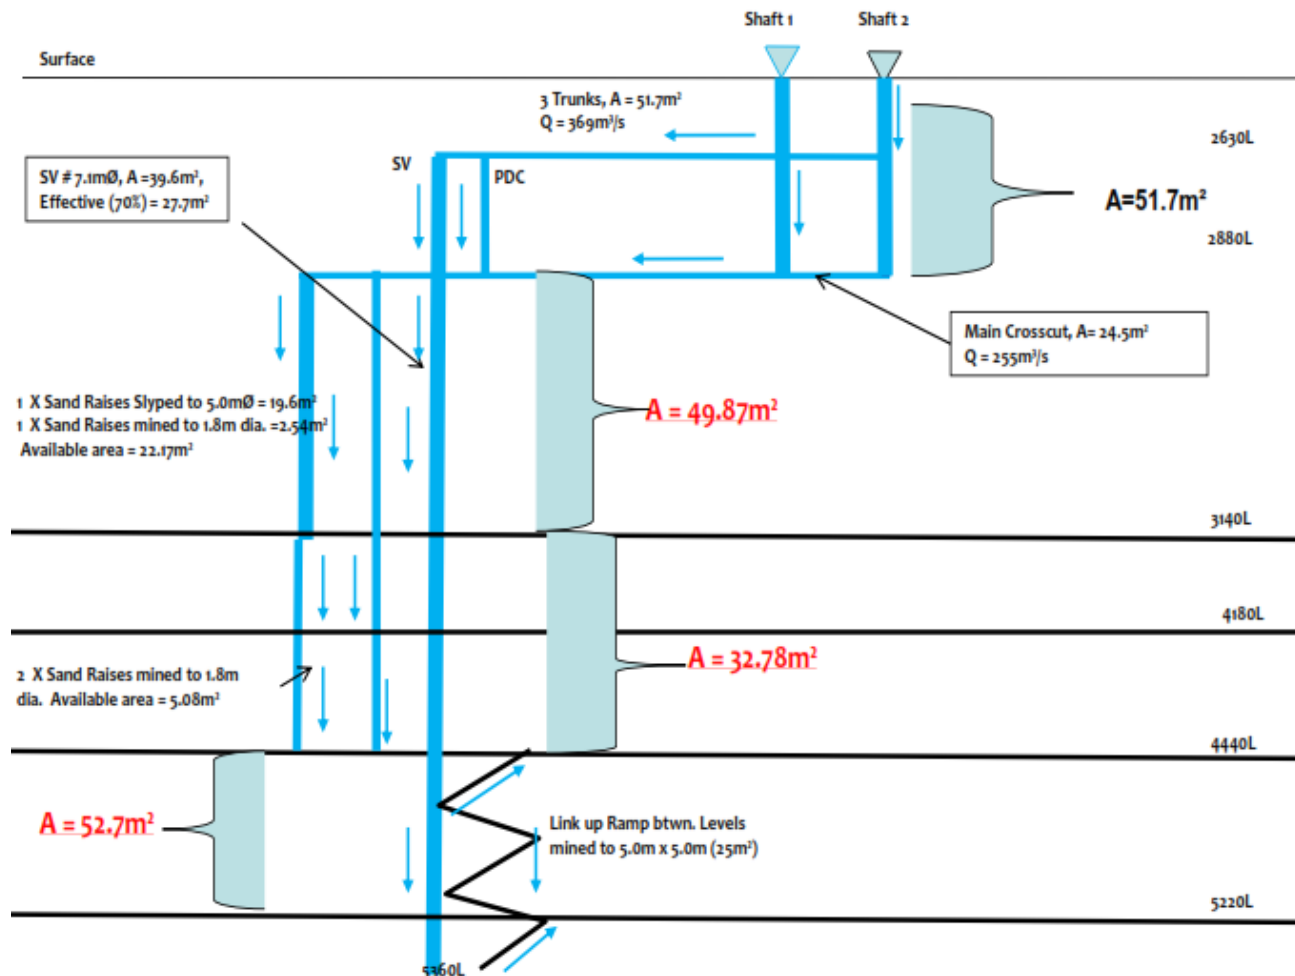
Current ventilation downcast systems (Mine Planning MSV)
